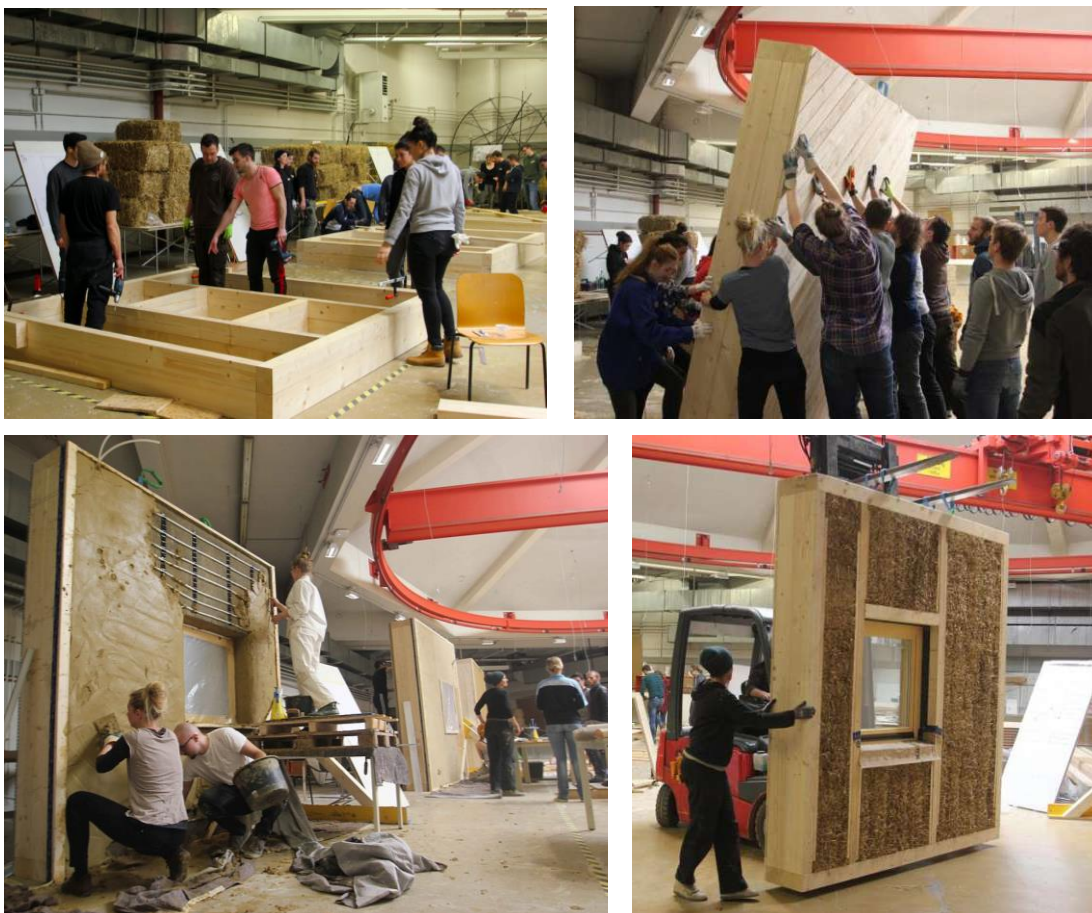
Construction of VIVI House in the TVFA Halle (Kichler, 2018)
